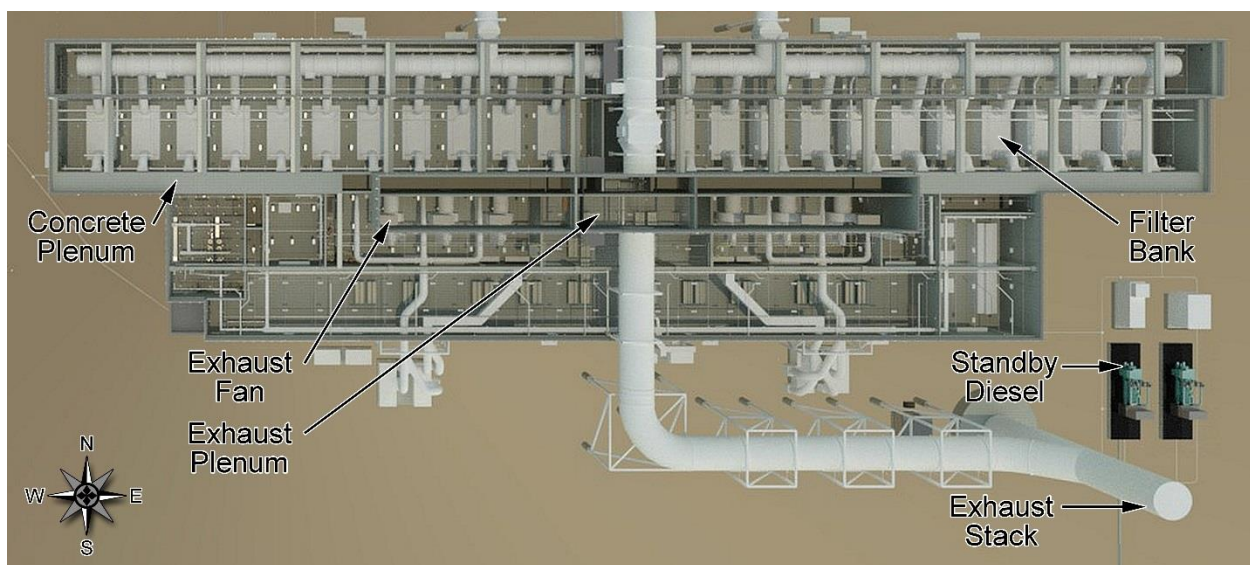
The New Filter Building houses 22 Safety Significant HEPA filter banks.
